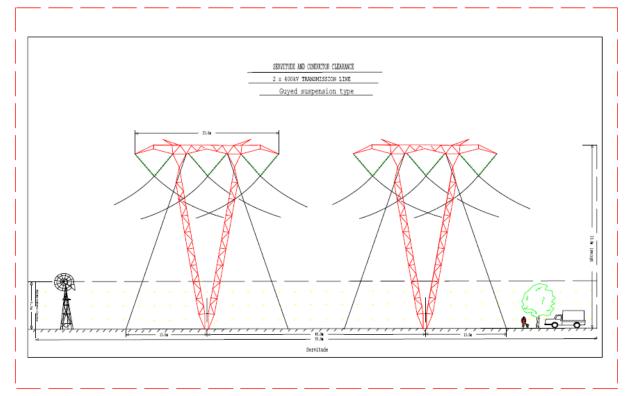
Example of the second potential proposed structure to be used, Guyed Suspension Tower
